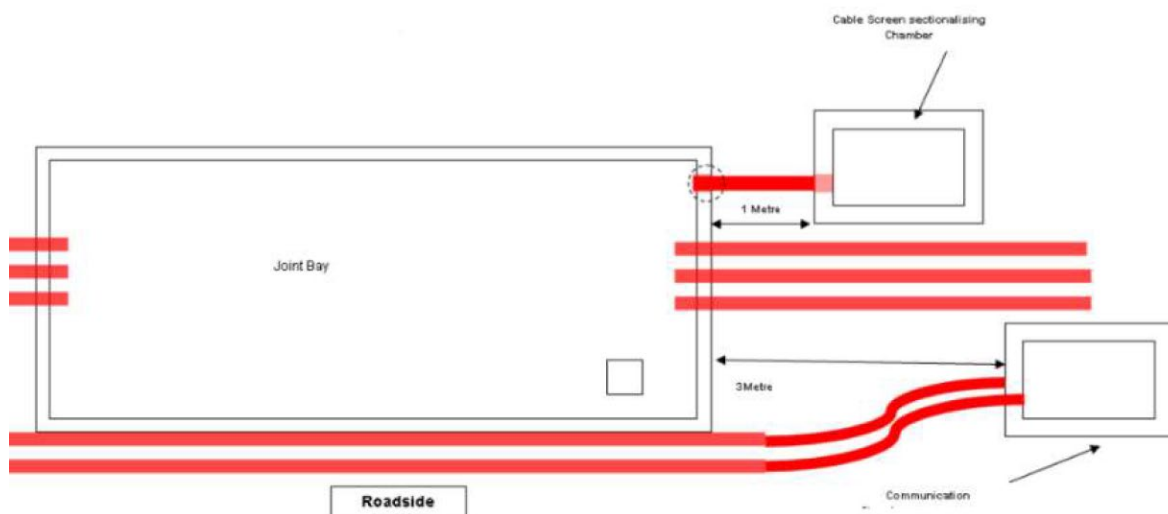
Typical Joint Bay and Link Box Plan Details
